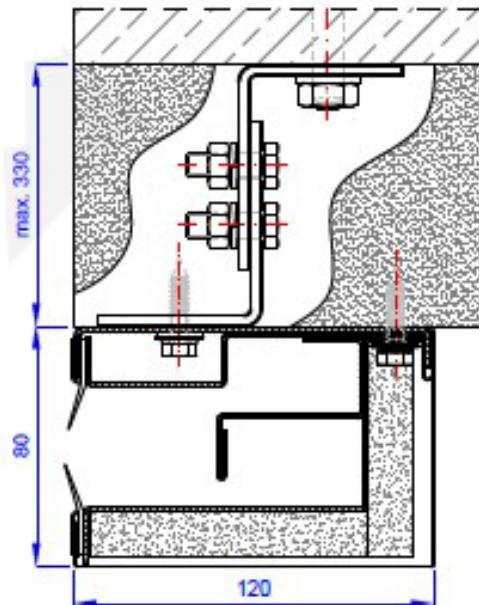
Guides mounted on spacer brackets – intermediate installation
